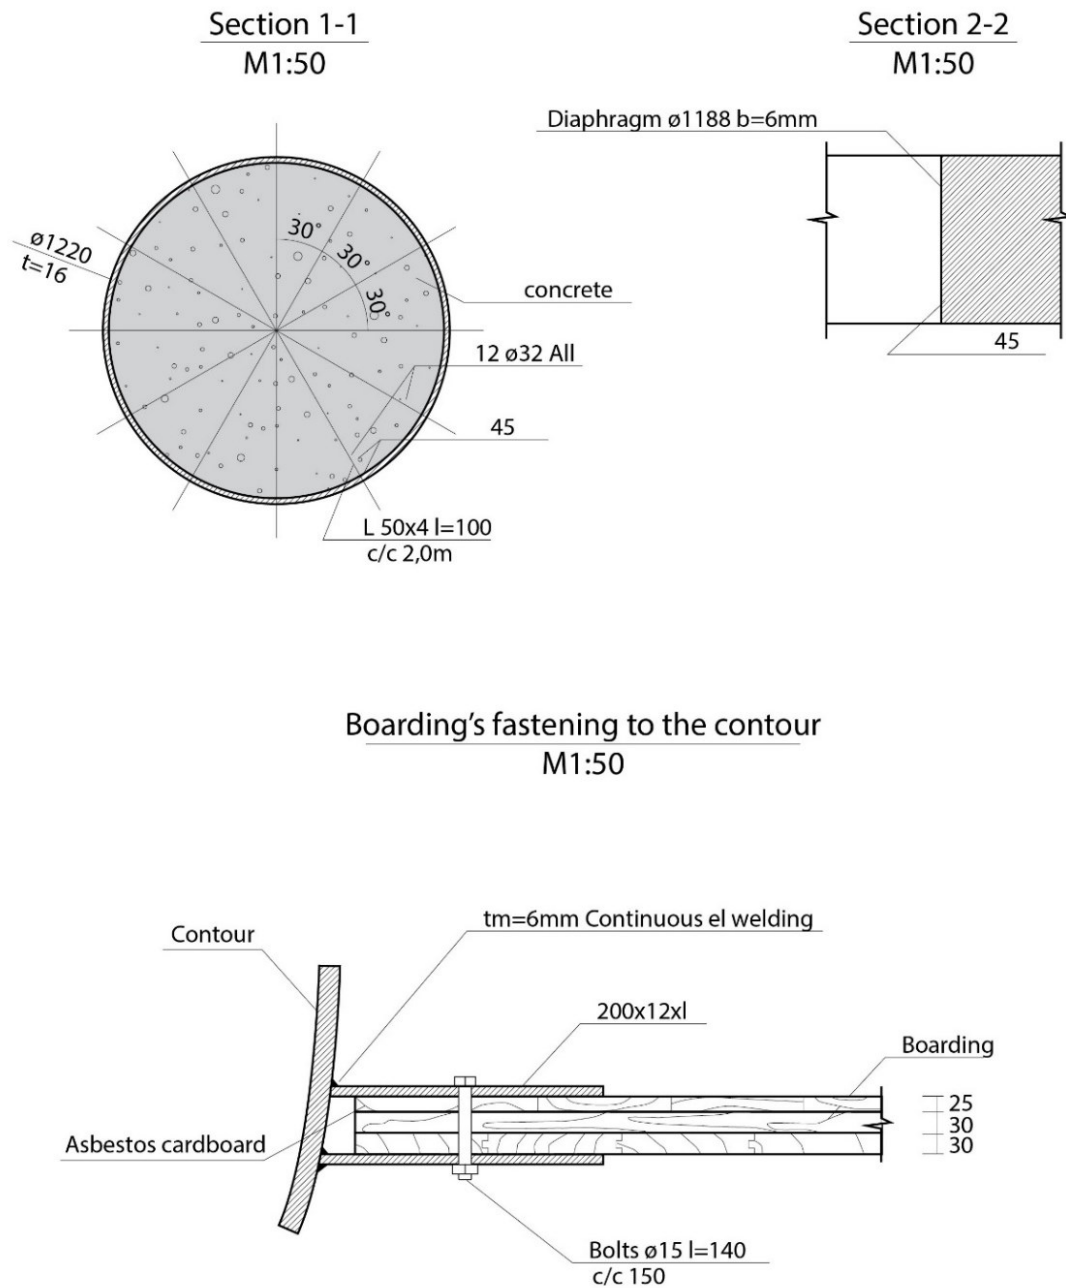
Reinforcement of the contour tube in the sections it is filled with concrete and the fastening of the timber shell to the contour tube.
